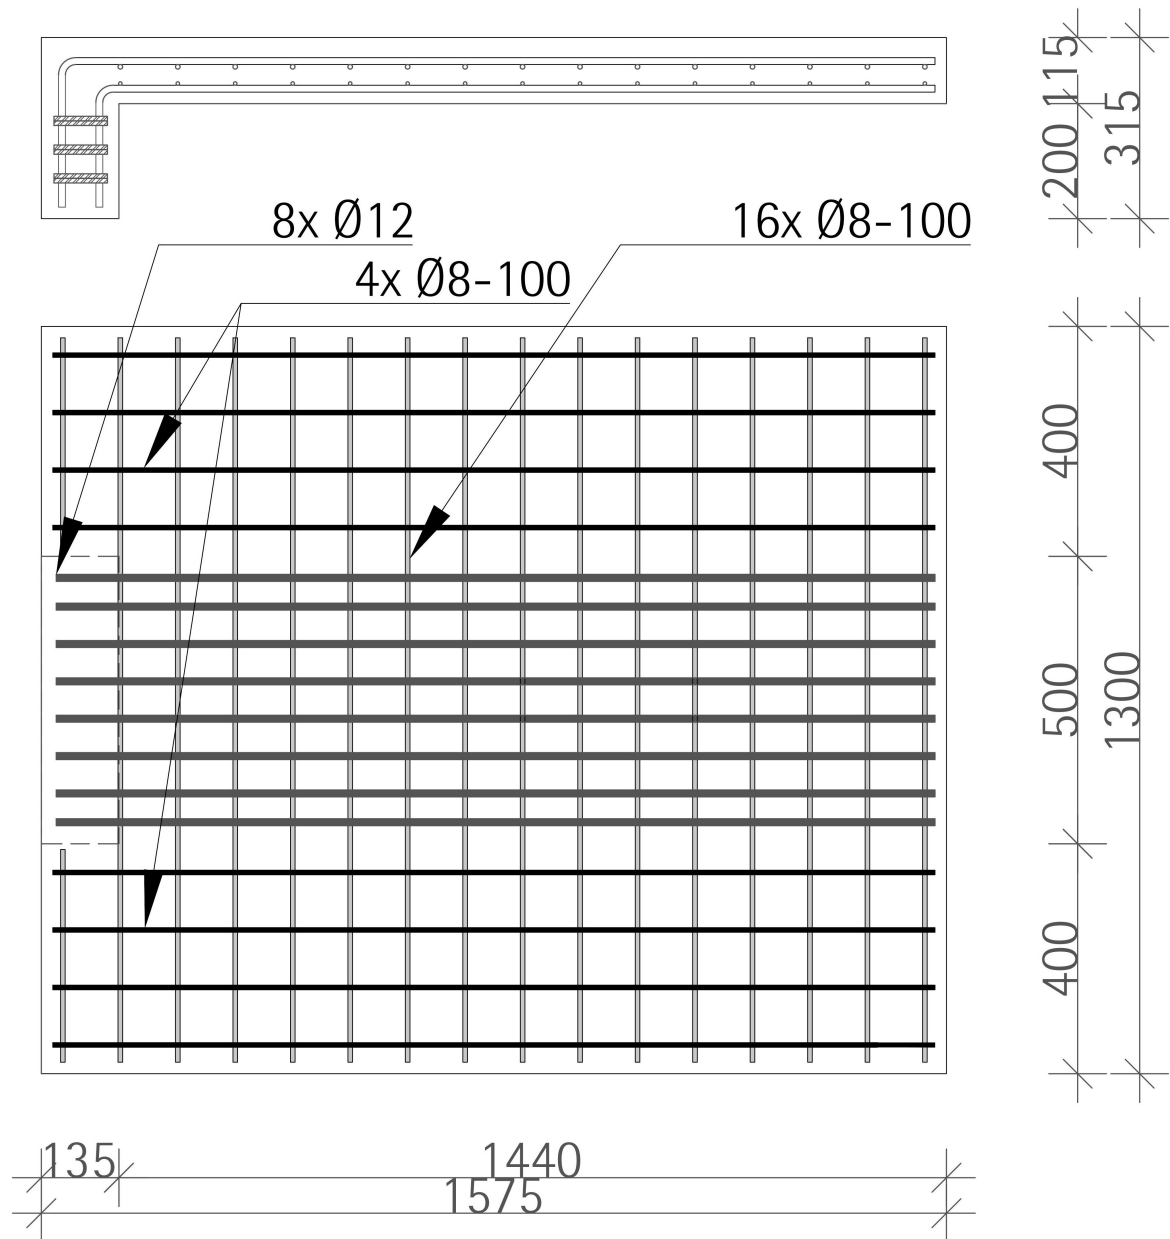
Top reinforcement configuration and side view of final design remake Hi-Con balcony.
